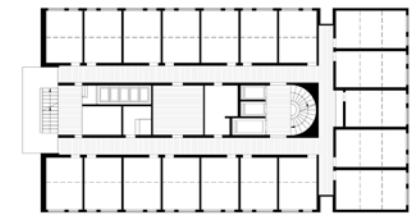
Plan of a typical floor in the Triemli City Hospital employees' housing building, with private rooms divided by structural walls.
